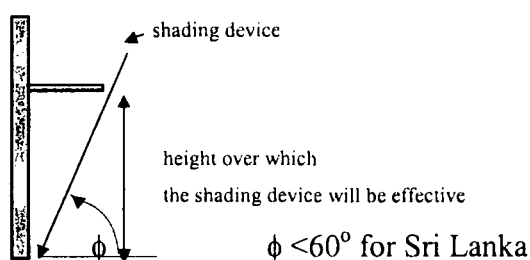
Overhang for a north or south facing opening of a Sri Lankan building
